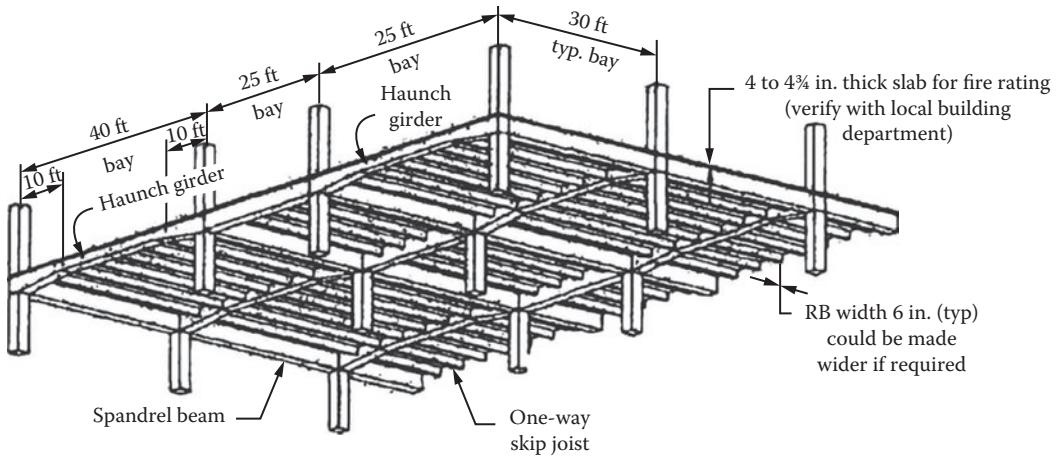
One-way joist system 30 ft × 40 ft bays.
